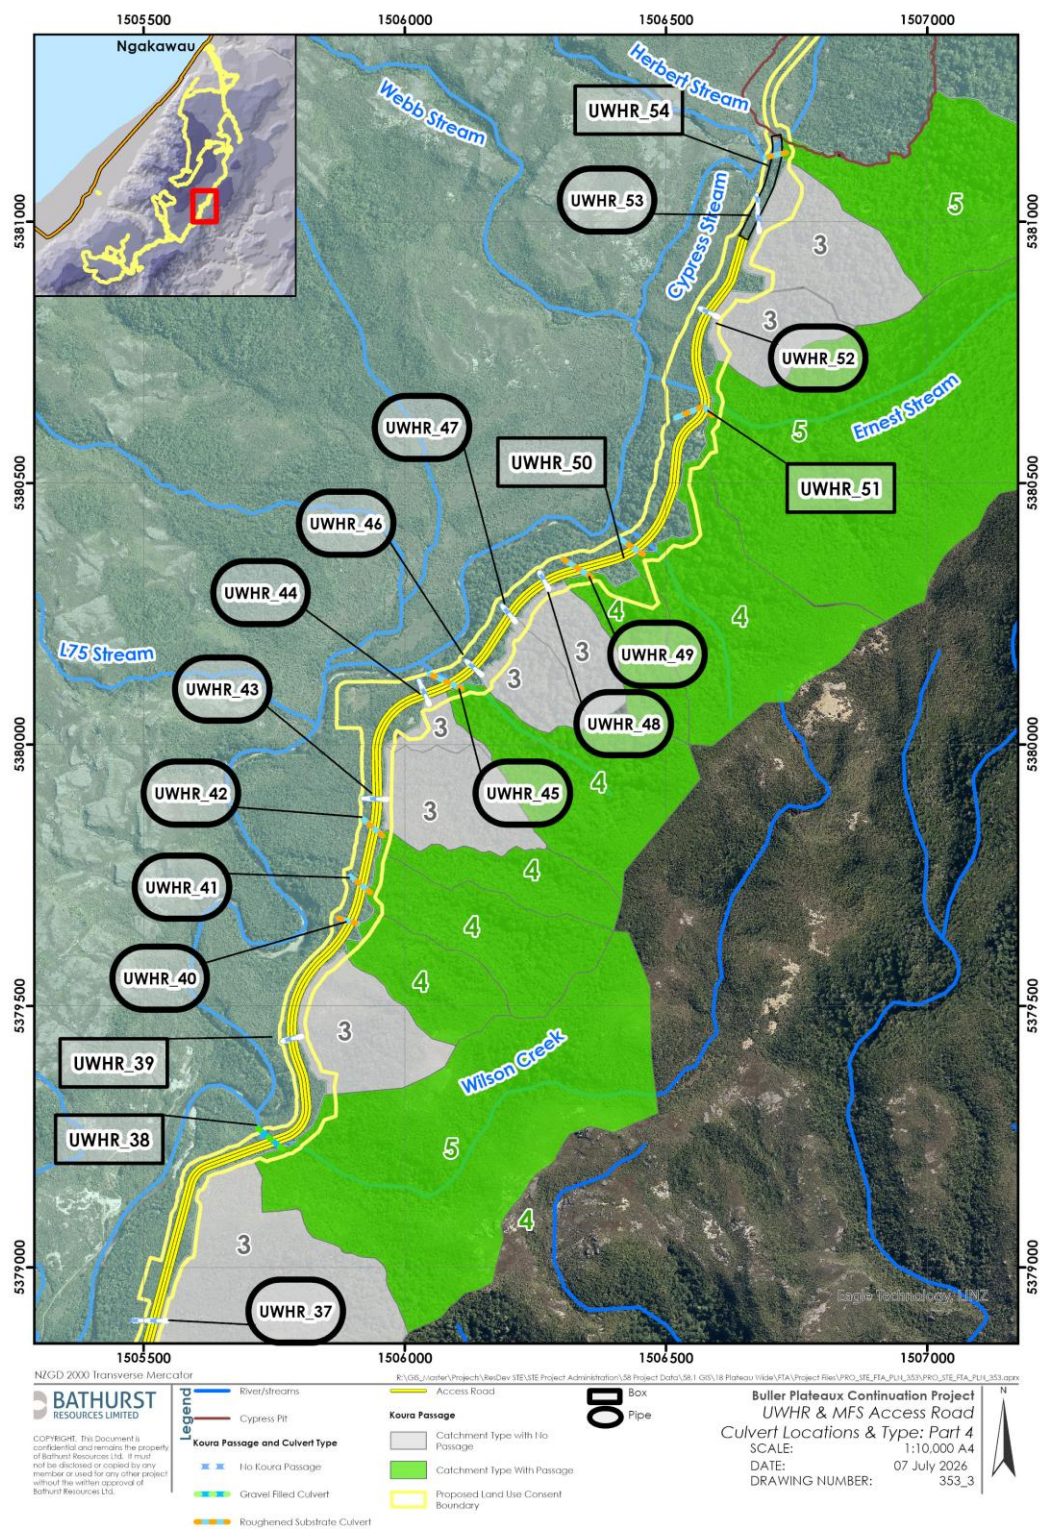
UWHR and MFS Access Road Culvert locations and Type: Part 4
